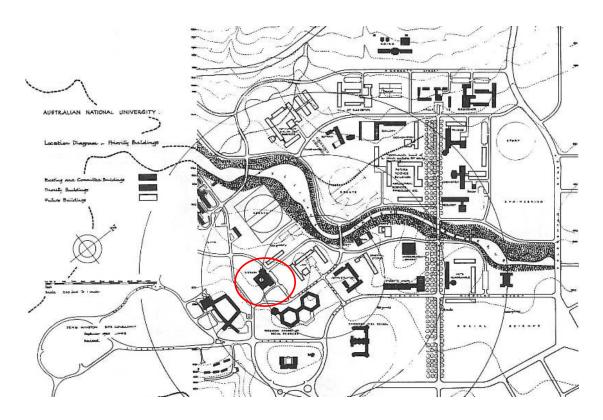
The first site plan that illustrated the final form of the Menzies Building was prepared by Professor Denis Winston in September 1960 (ANU F&S 1973, Plate 21).
